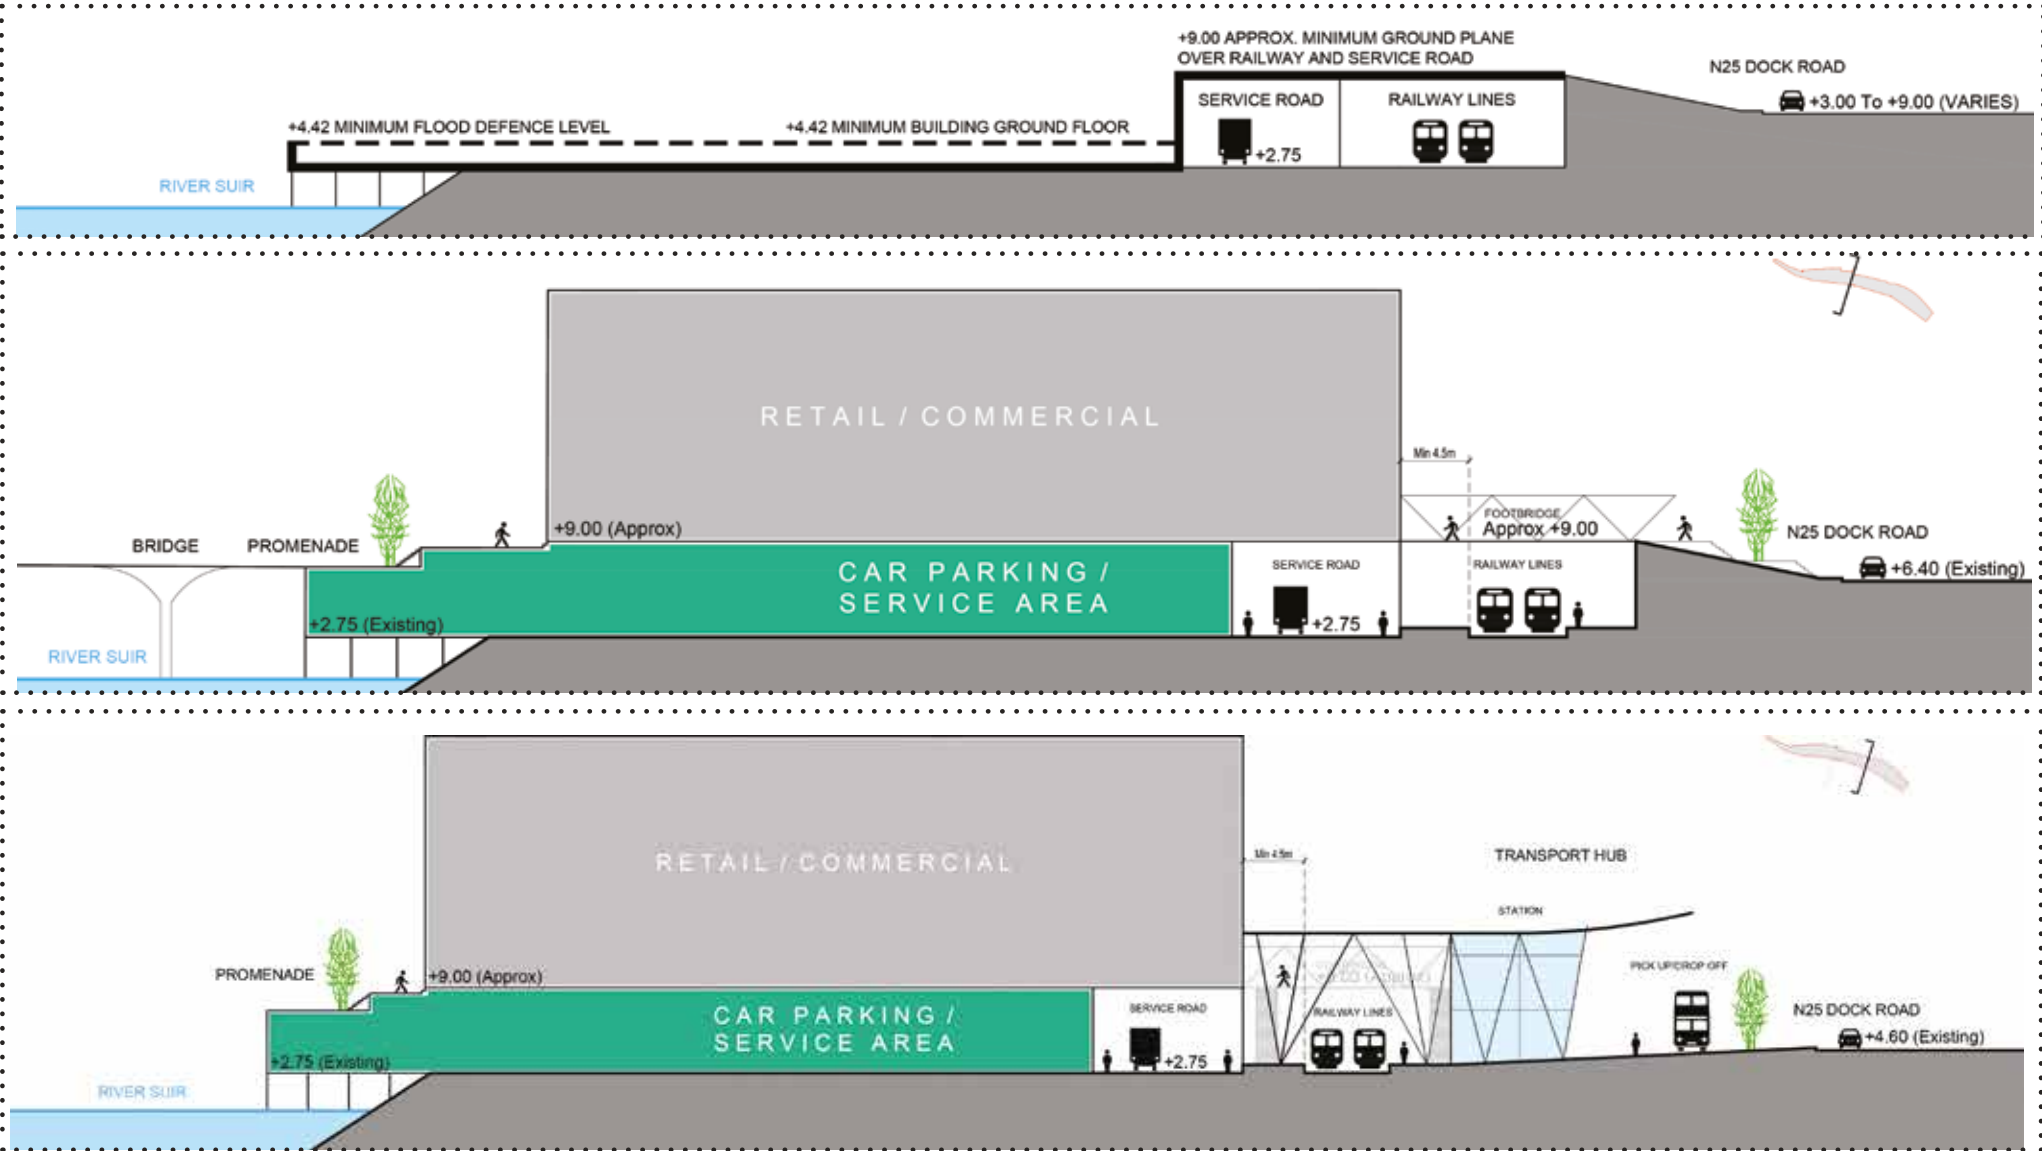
,14 & 15: Typical Schematic Cross Sections through Central Zone
